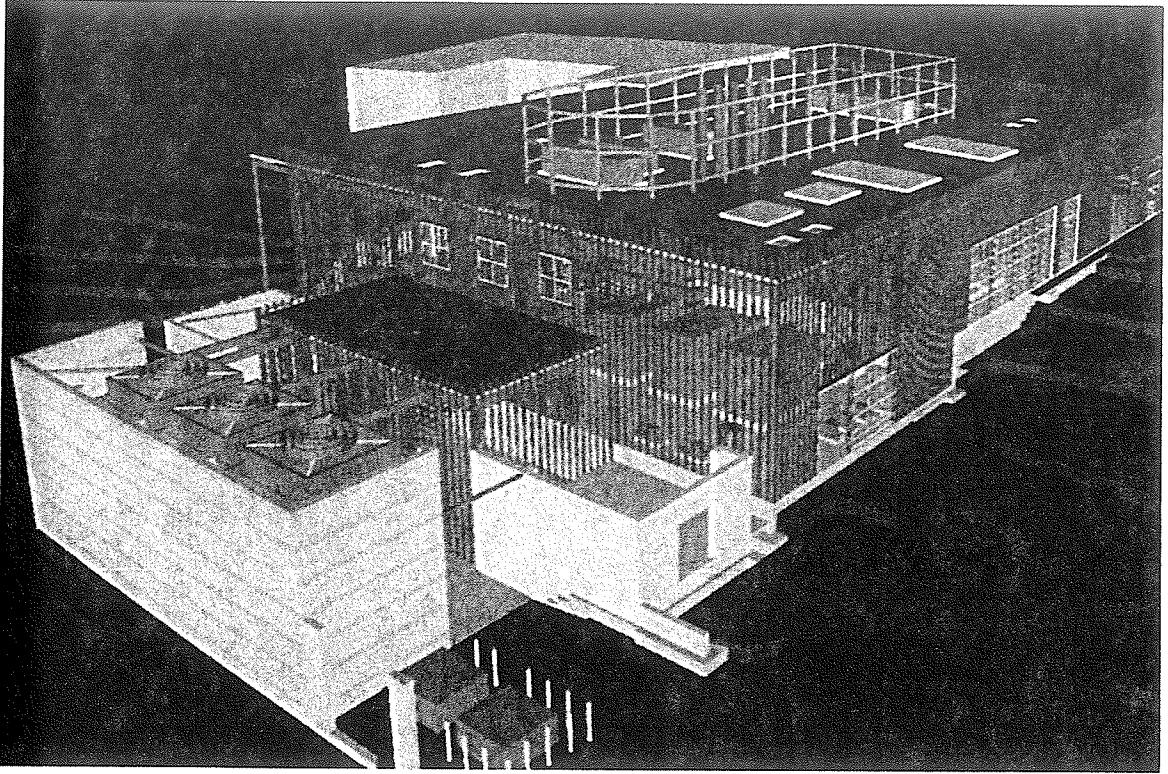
March 1995 Completion of exterior metal studs. Begin piping work on interior of the building.
